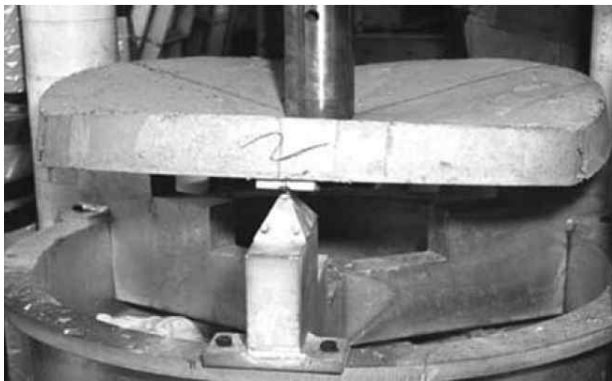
Suggested support fixture (ASTM C 1550, 2005)
